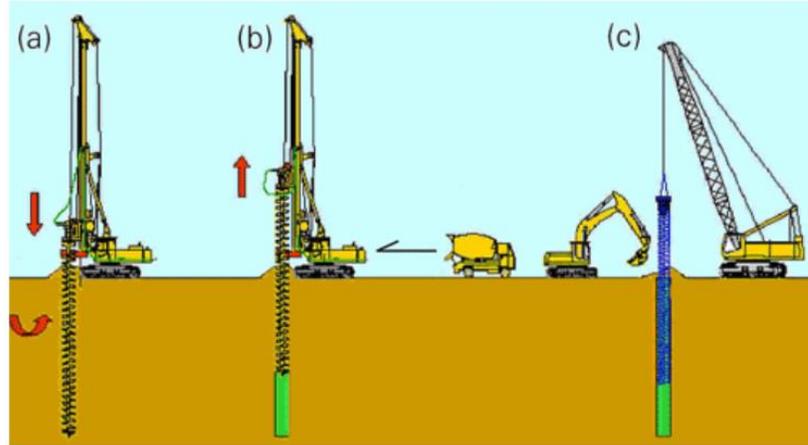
66 Continuous flight Auger pile as bridge foundation [13].
